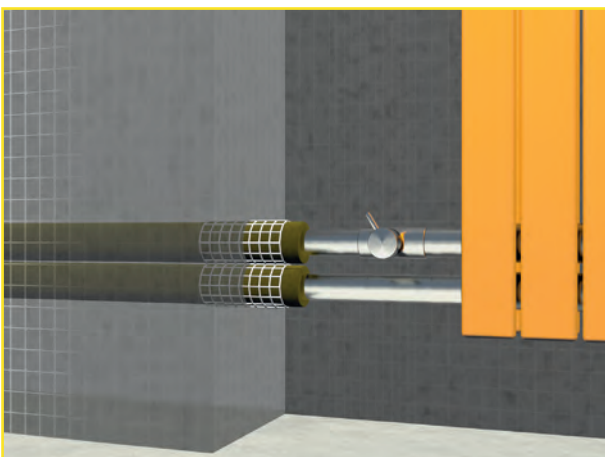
Optional wall penetration of heating pipes - Ø x 2 to the outside and inside
